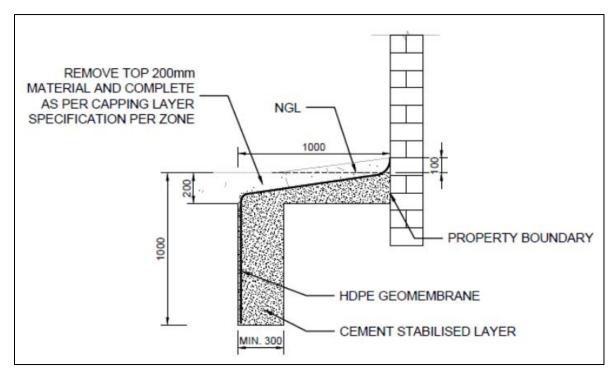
TYPICAL CROSS-SECTION OF PROPOSED RODEN BARRIER (SOURCE: WALTERS, 2020)
